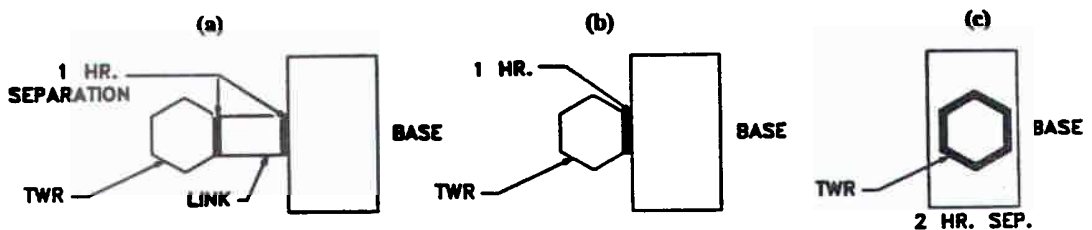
Fire-Rated Conditions for Tower with Base Building
